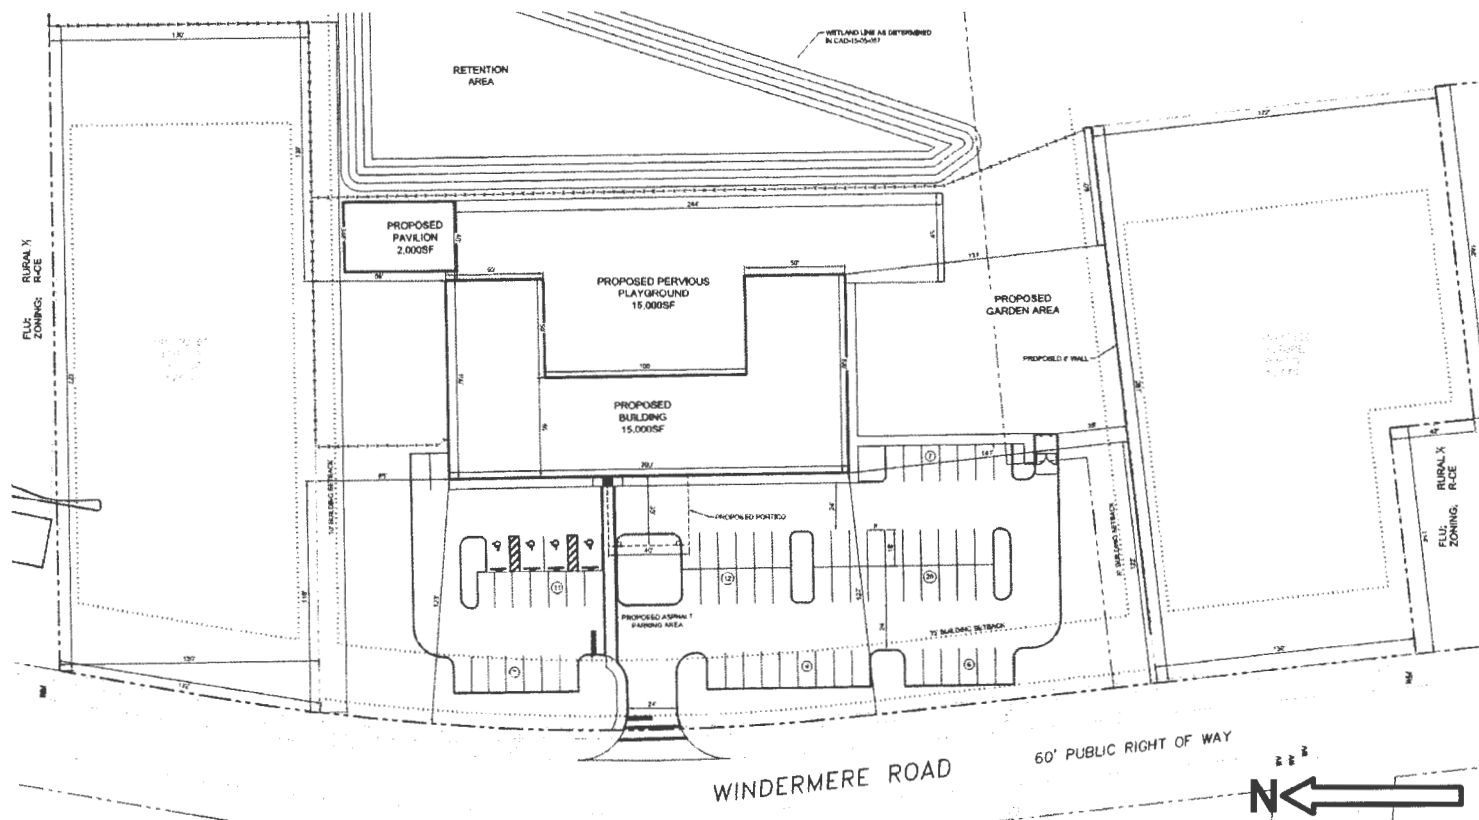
Site Plan of proposed Wondermere Garden Preschool.
